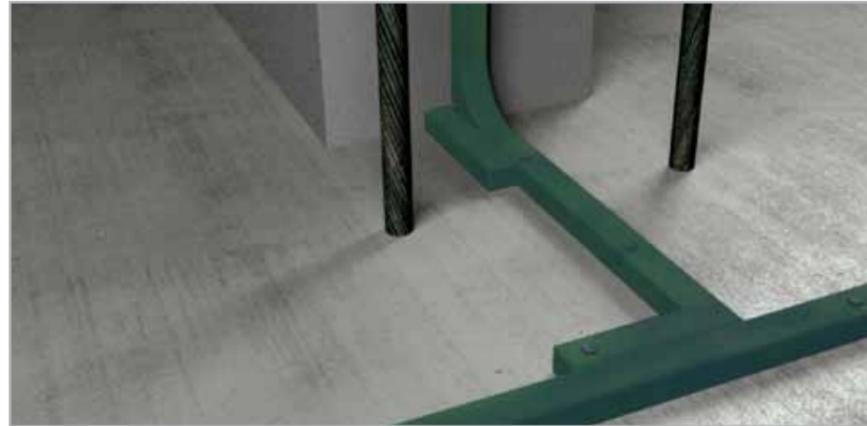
Strips of IDROSTOP B25 used to seal construction joints between a foundation pad and the walls and construction joints between adjacent walls
